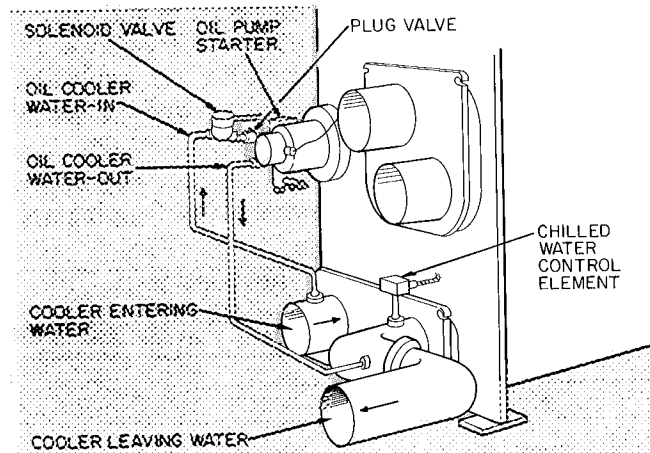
Chilled Water to Oil Cooler Piping (Typical)
